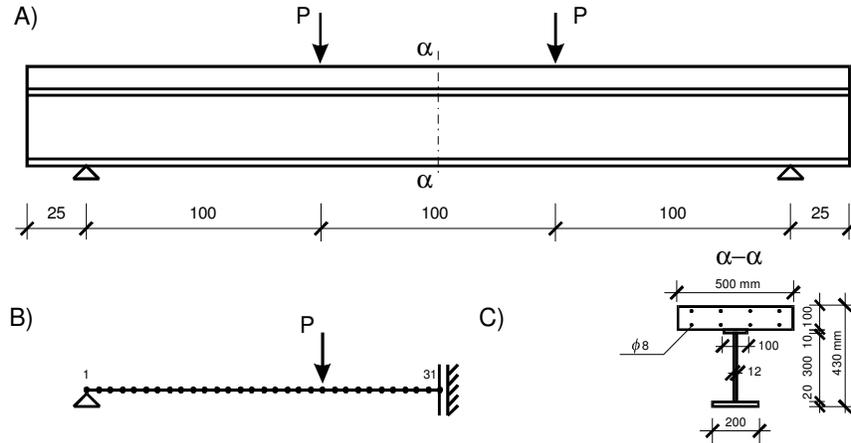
A) Diagram of a composite girder, B) Division into finite elements, C) a cross section of the girder and the reinforcement of the slab
